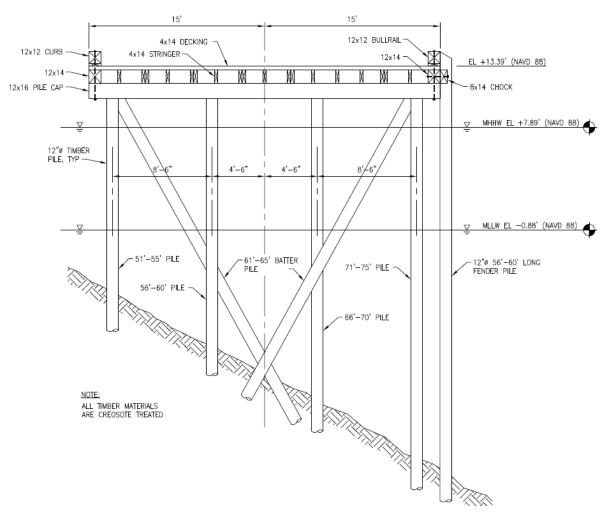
Typical Section of Intact Marginal Wharf (from Sheet C104 of August 2020 95% Plan Set by Reid Middleton)
